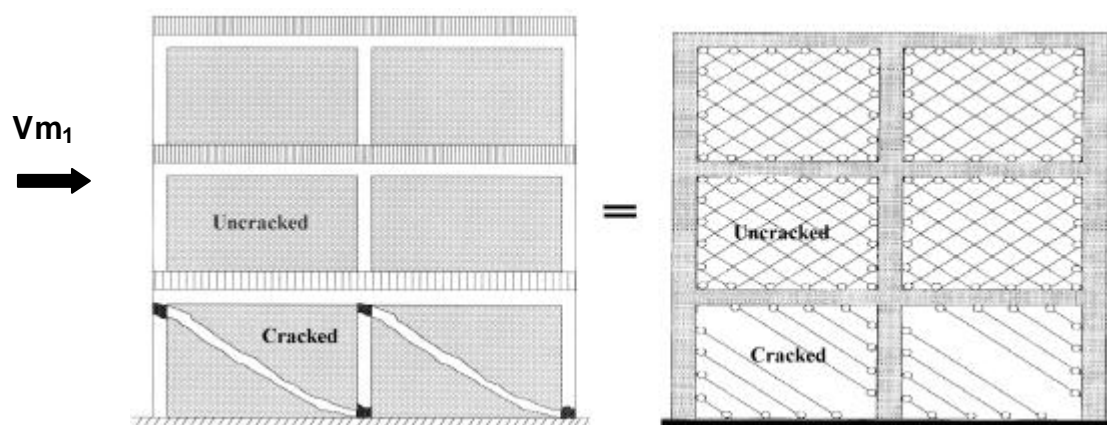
Model used to calculate the forces at the wall confinements in complex cases
